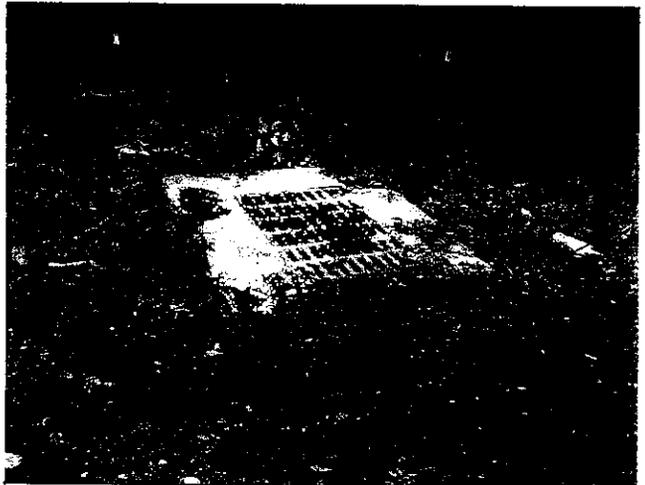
No inlet protection is present on the storm drain in the northwest corner of the site.
